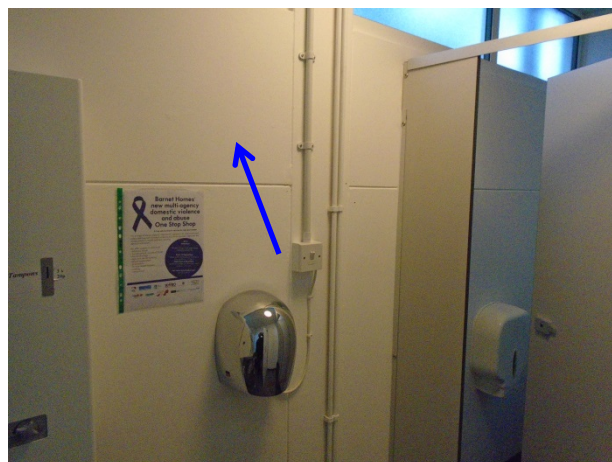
G.03 Managers Office – Asbestos insulating board (AIB) infill panel previously identified to wall. Now over-clad
